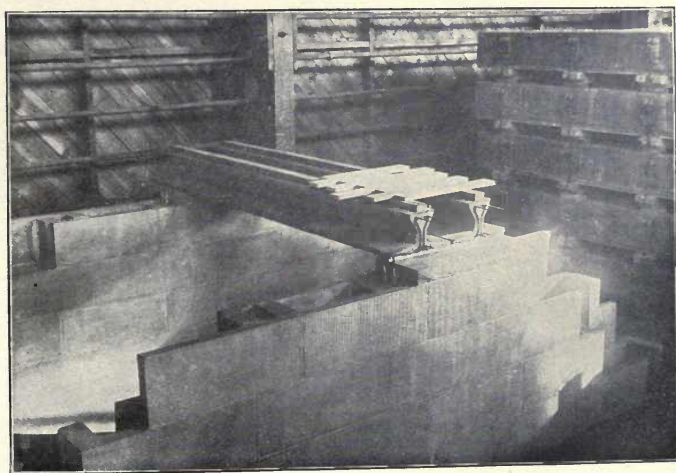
Standard Floor Joists resting on Concrete Block Walls. (See p. 193.)
